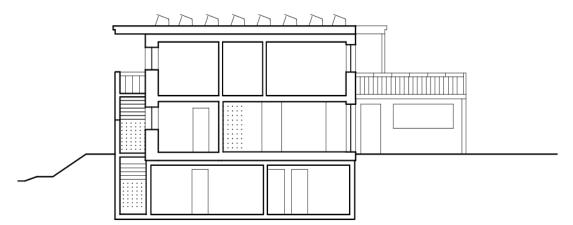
Section a-a Residential House, CH, scale 1:500 (Voss et al., 2013)
